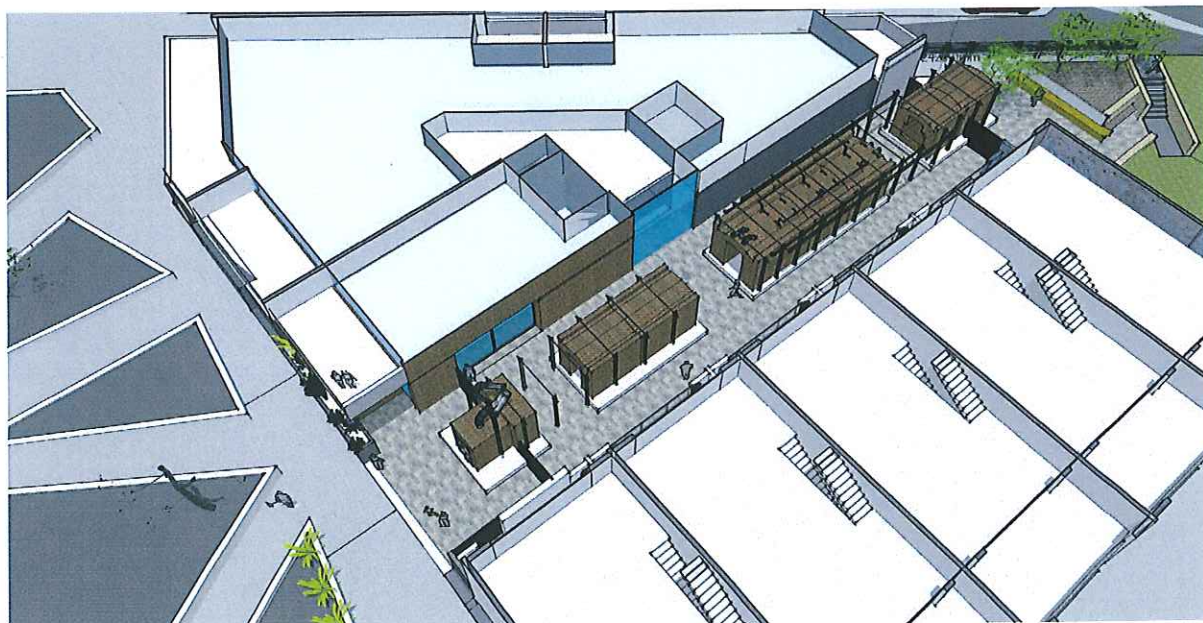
Plan showing proposed Kiln extent in position in common area on Lot 206N. *Hames Sharley
